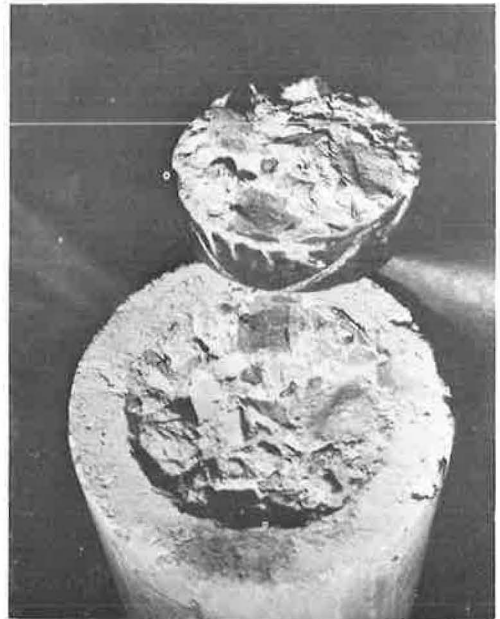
Concrete-to-steel tension test showing $\frac{3}{16}$ -in. bond line resulting in concrete failure, and unruptured white line between epoxy compound and concrete.
